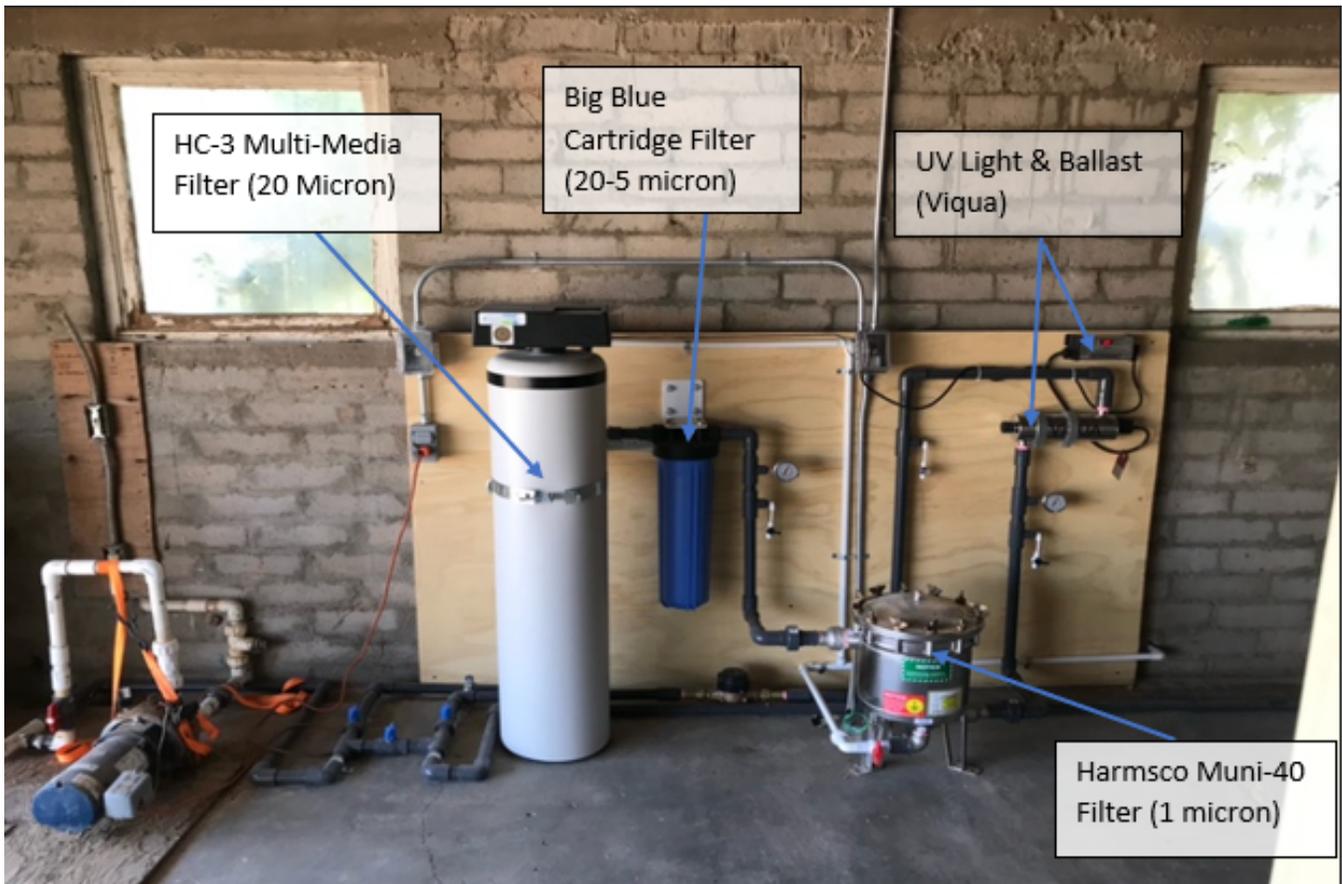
Typical POE Design – Installed within a Garage (POE# P-20)
